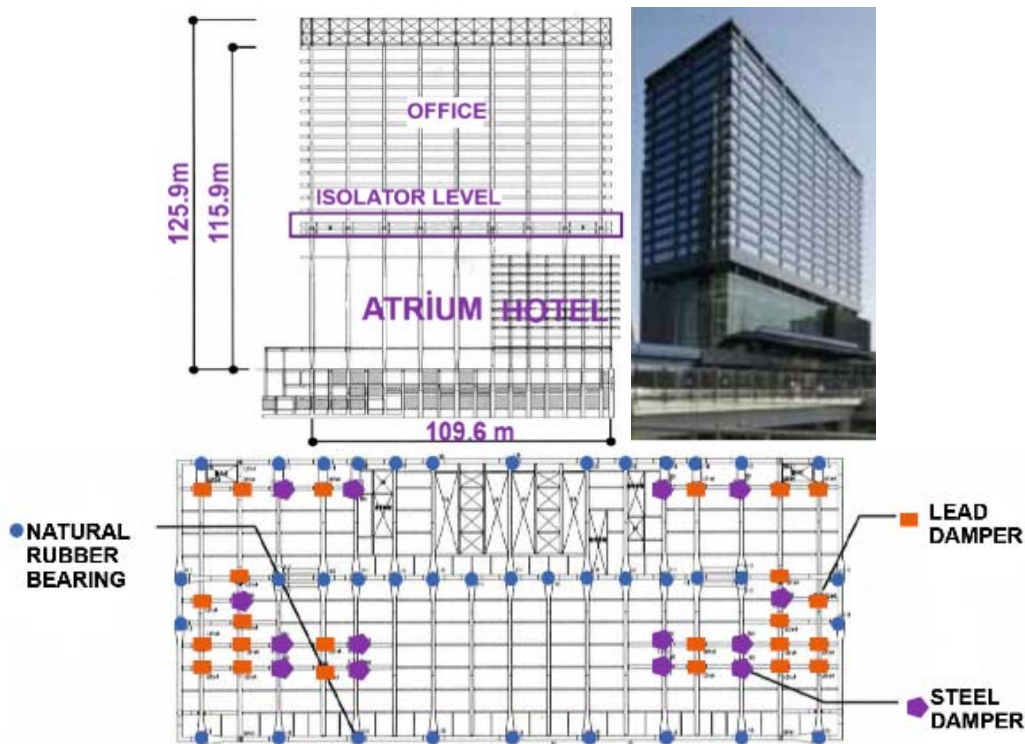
Shiodome Sumitomo Building plan, section and photo [8]-[10]
